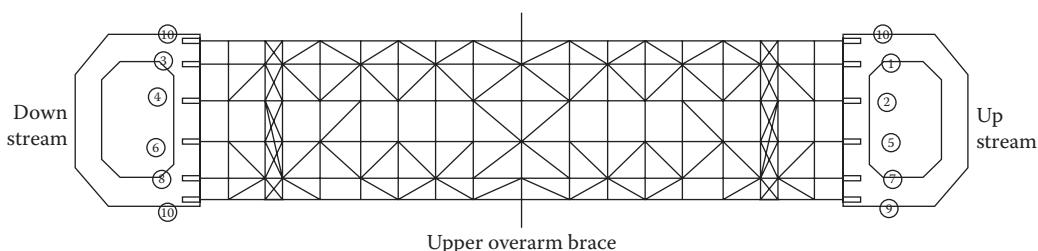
Falsework installation sequence of crossbeams, Yangluo Bridge. (From Zhang, M. et al., *Bridge Constr.*, 6, 2006.)
